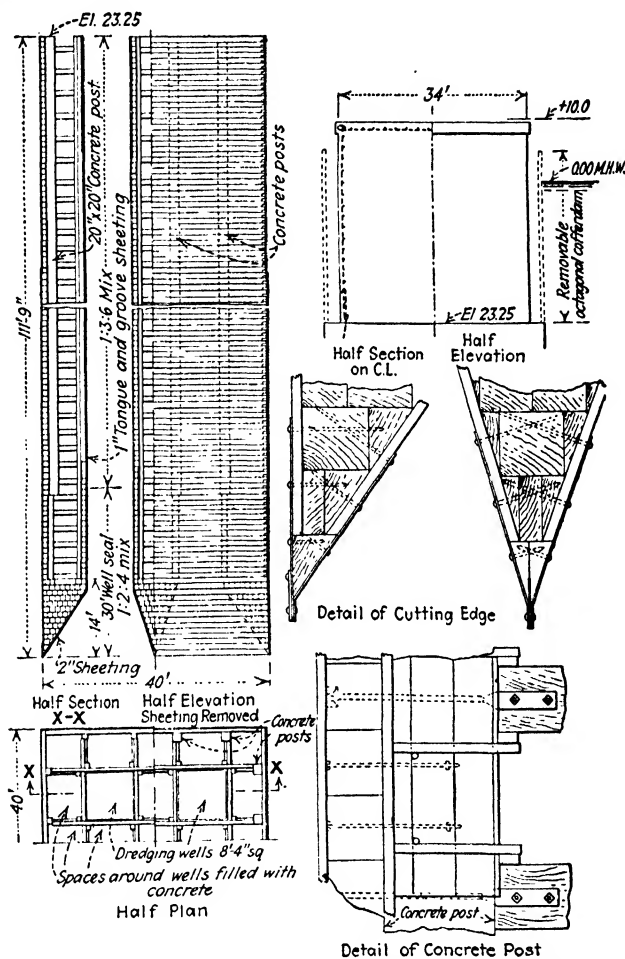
Timber Open Caisson with Dredging Wells of the Carquinez Strait Bridge.
